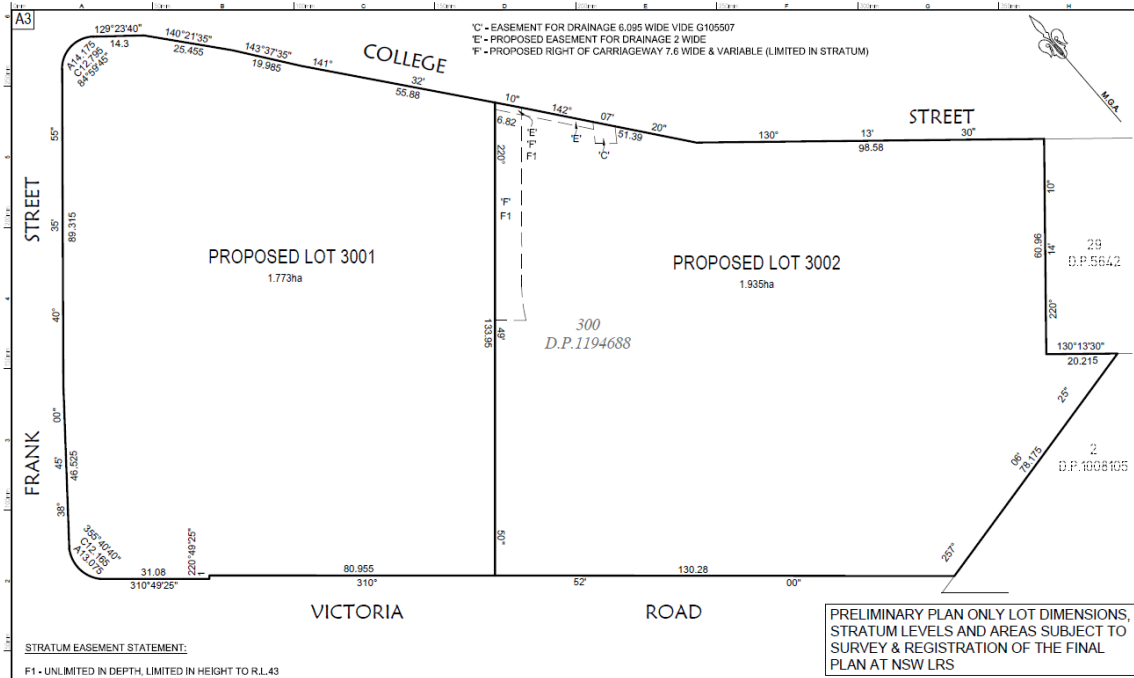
The proposed subdivision (Stage 1) (Source: Craig & Rhodes).
